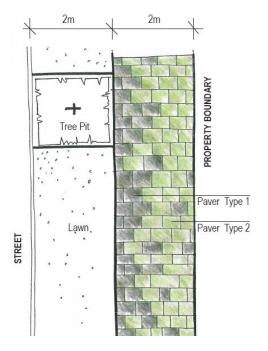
N Footpath Paving -Stringybark Road & 'A' Street (Town Centre)
